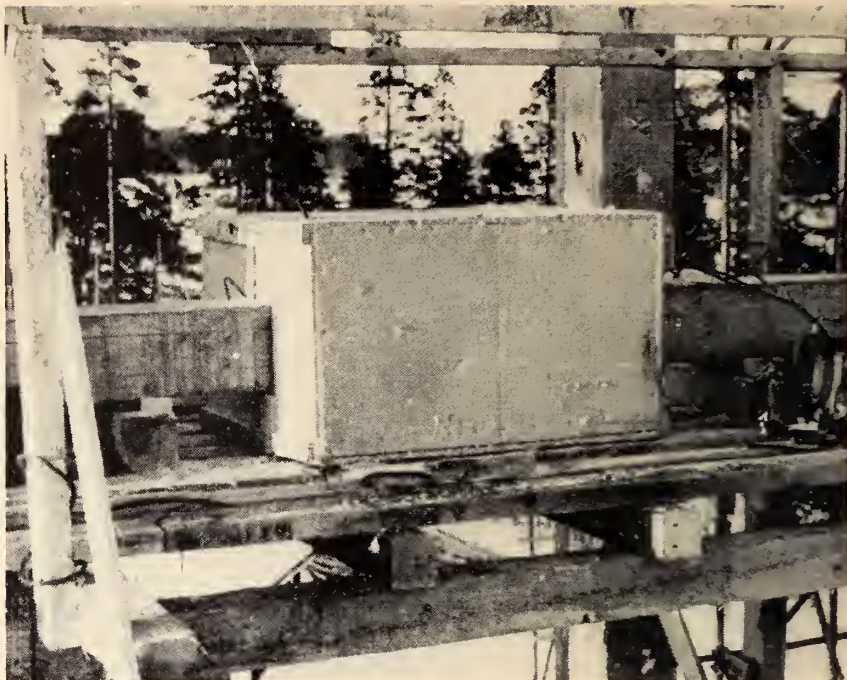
Joints made with cast-in-place concrete require winter protection. This fibreboard box could be heated with a single electric light bulb.
